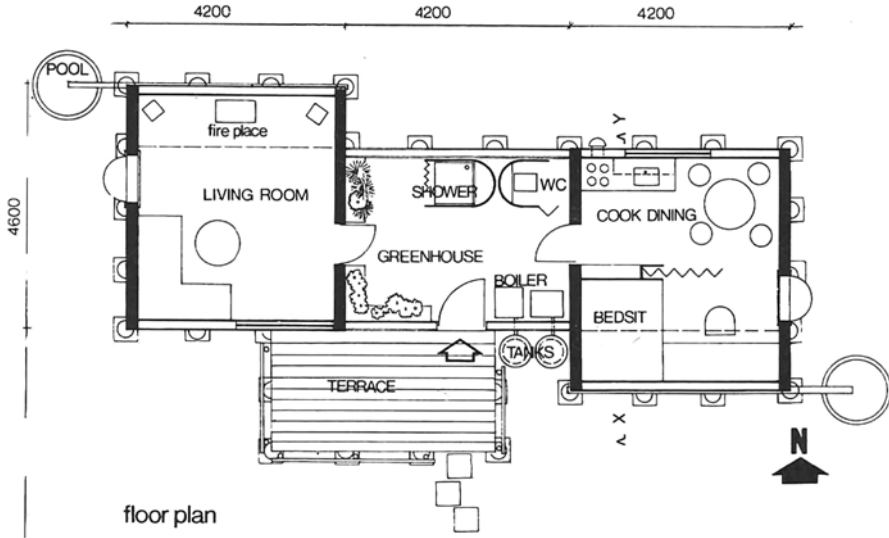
Two-person dwelling, SUG; ground floor plan; the greenhouse in the middle is also the entrance, containing shower, toilet and boiler. (Source: Kan and Poteliakhoff 1978)
